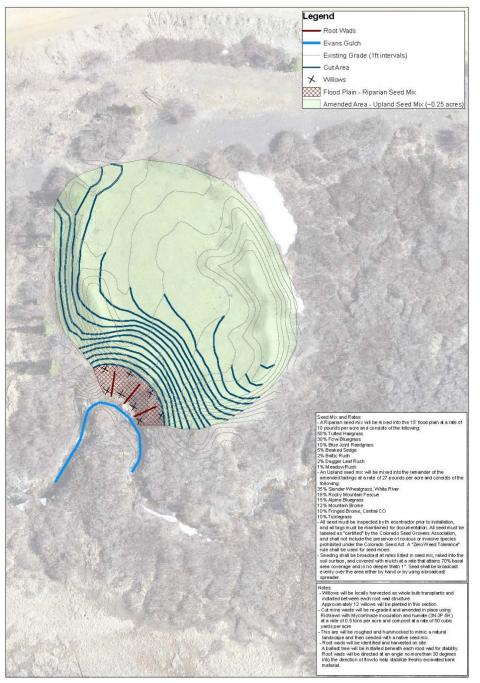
30% design detail of the Streamside site showing section of over-steepened waste to be relocated on top of the pile, as well as proposed contour lines of cut material. A floodplain bench will be created with a combination of three root wads, 12 willows, and sedge mats.
